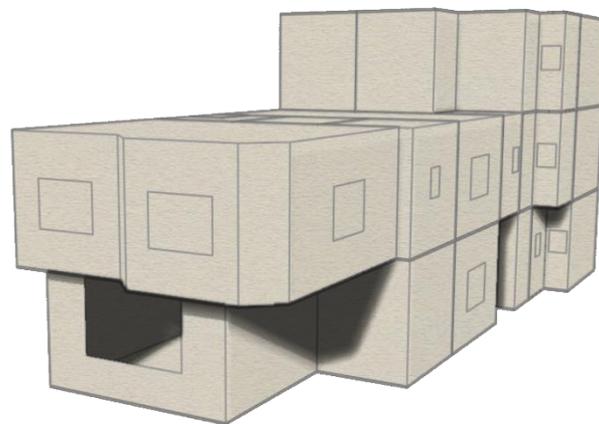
3D Schematic of a Typical Building Without Rawshan
